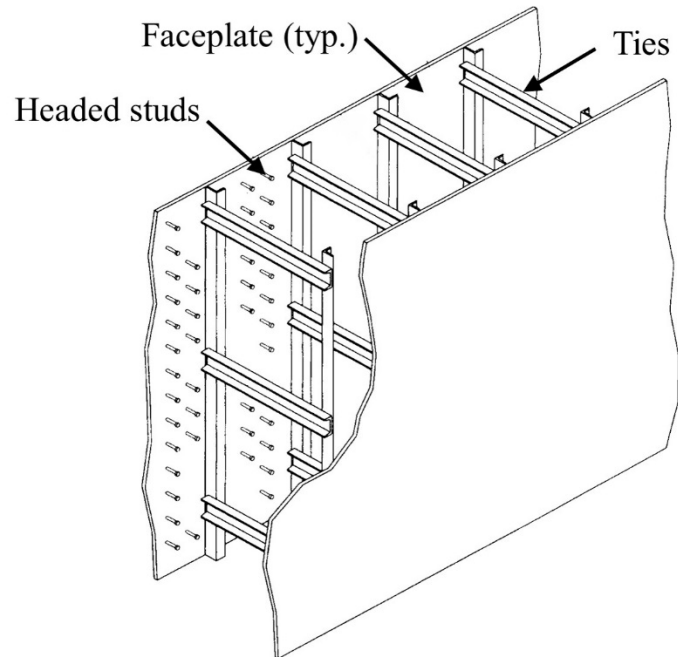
Typical structural wall module in AP1000 plant (from [102]) (©Westinghouse Electric Company, LC. All rights reserved).
